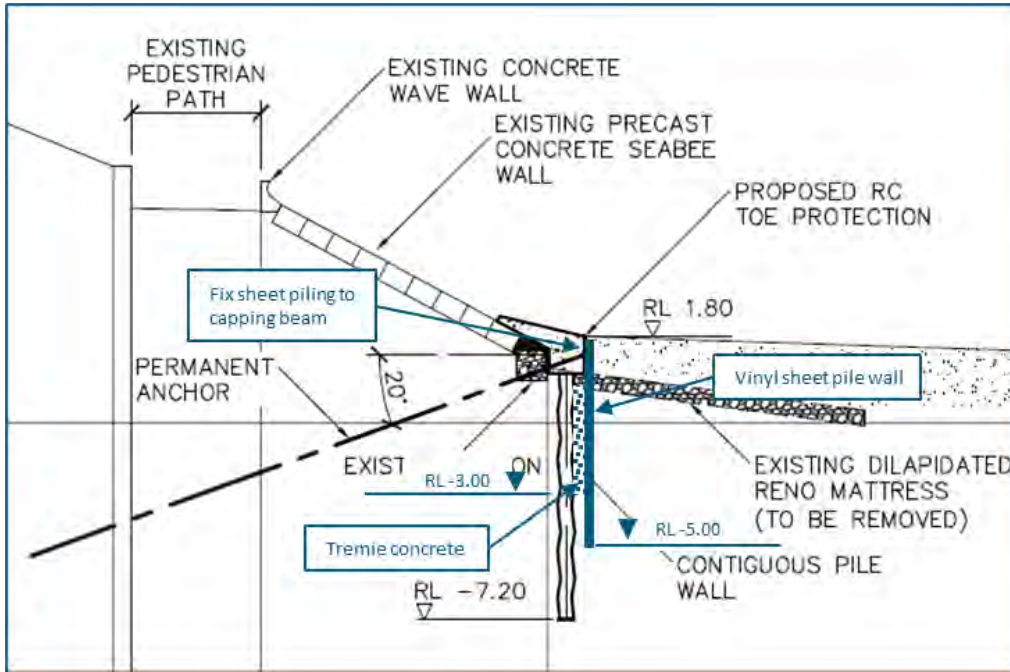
Vinyl Sheet Pile Wall installation in front of contiguous pile wall
